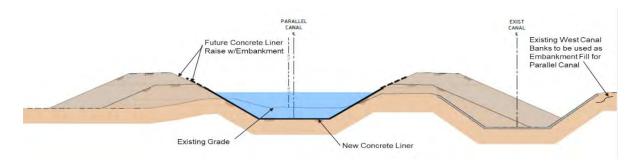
Trapezoidal Cross Section in the Parallel Canal Alternative
